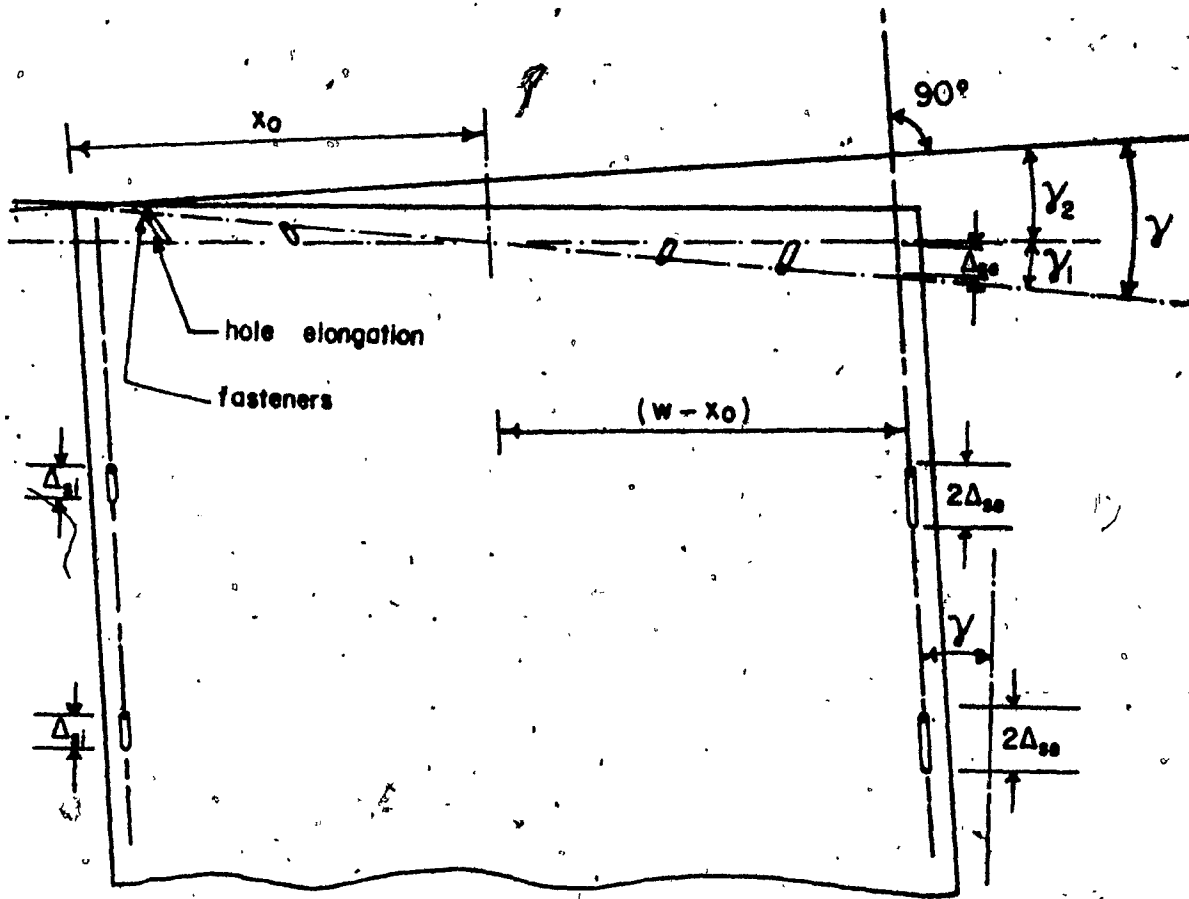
Deformation of an end panel and fasteners (Ref. 15)
